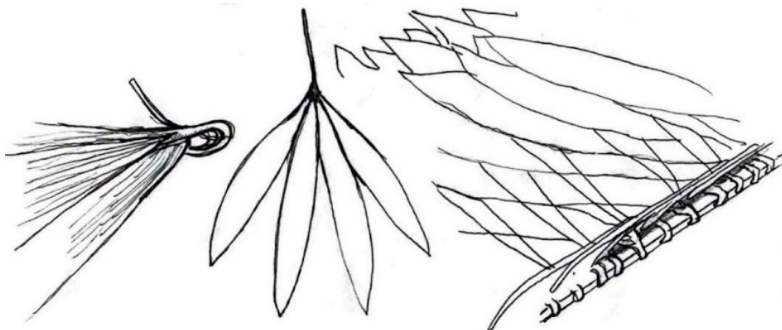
Irapay palm leaves duration: 3 - 3 ½ years (Source: drawn by author)
